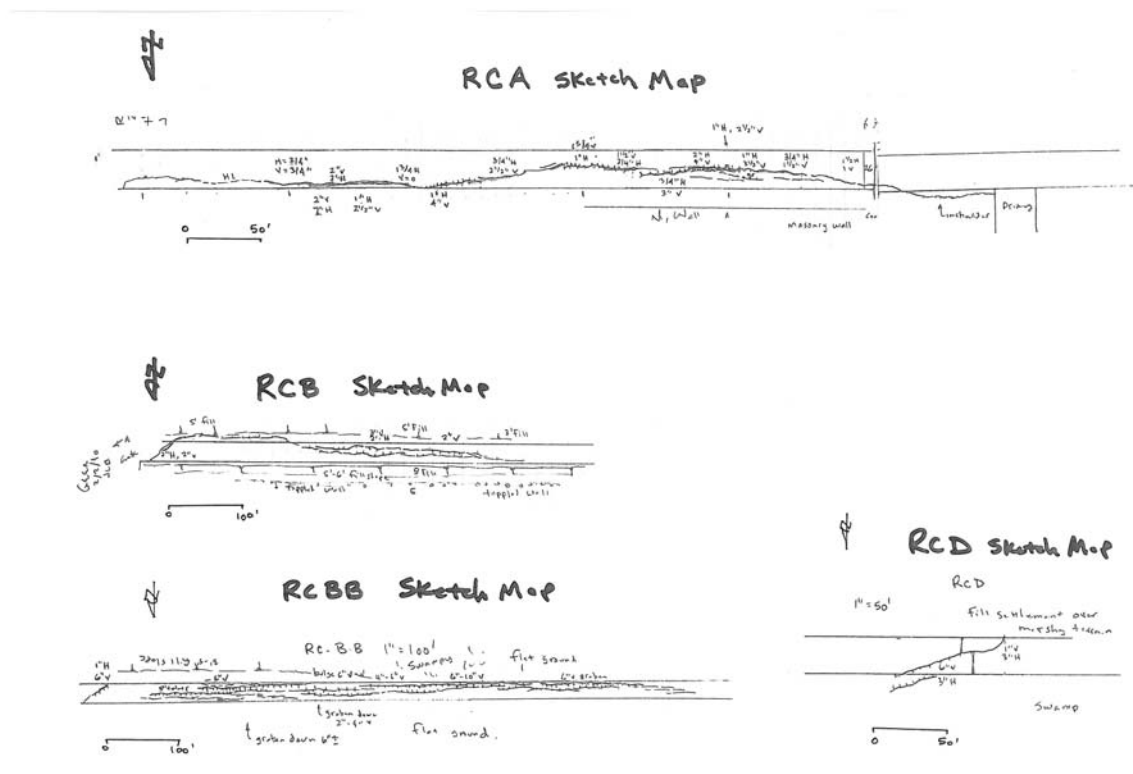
Road fill failure sketch maps for sites RCA through RCD.
